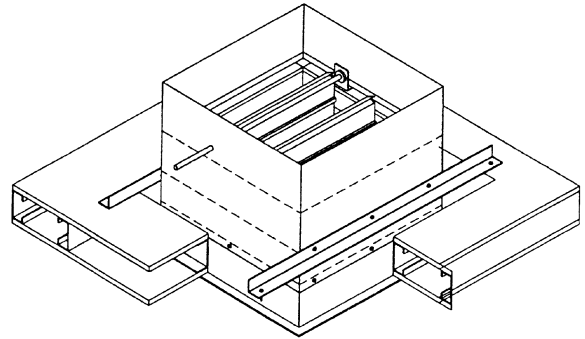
DAMPER WITH ACTUATOR MOUNTED EXTERNALLY
